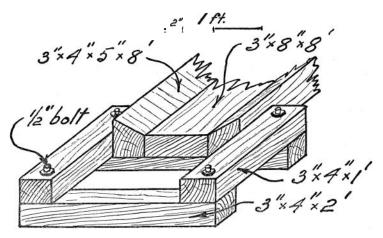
The details of construction of one section of a Sykes portable saw log chute. New York.
